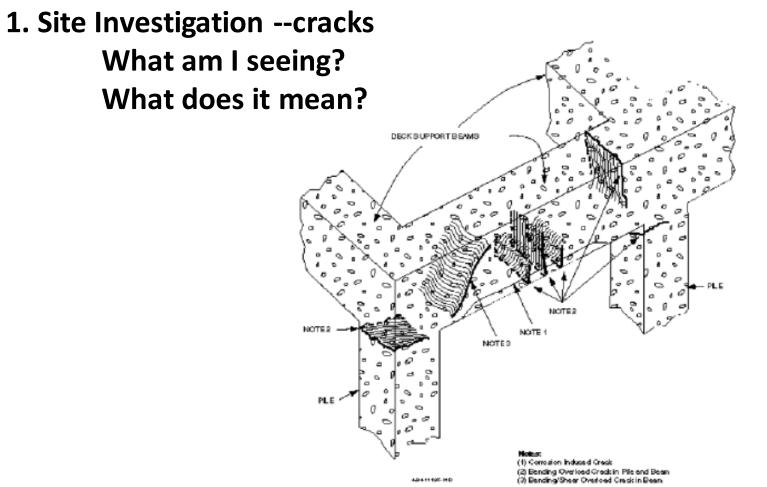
Concrete Crack Indications of Cause (from MOTEMS Audit Manual 2017)
